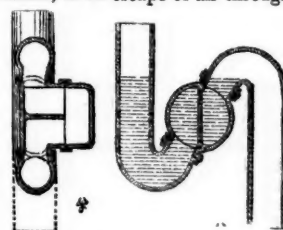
Anti-Siphon Trap.—Fig. 82. Longitudinal Section. Transverse Section.
